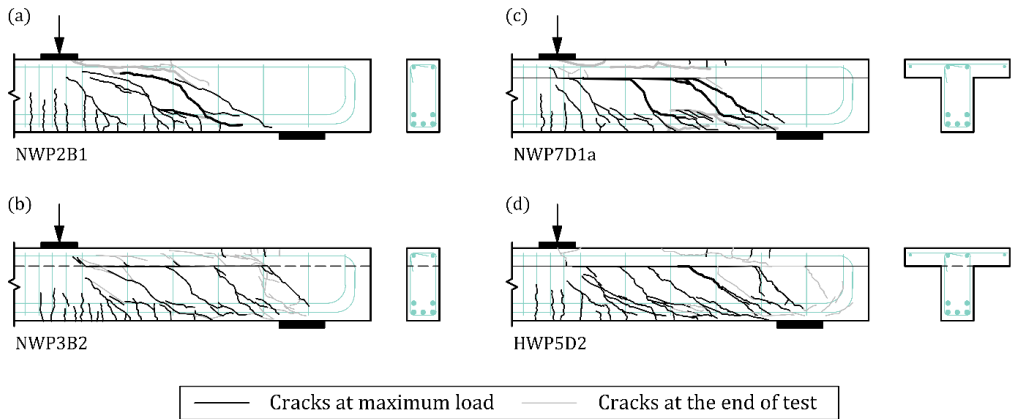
Crack patterns in beams with different cross-sections: (a) monolithic rectangular beam; (b) composite rectangular beam; (c) monolithic T-shaped beam; (d) composite T-shaped beam. Adapted from [14,15].
